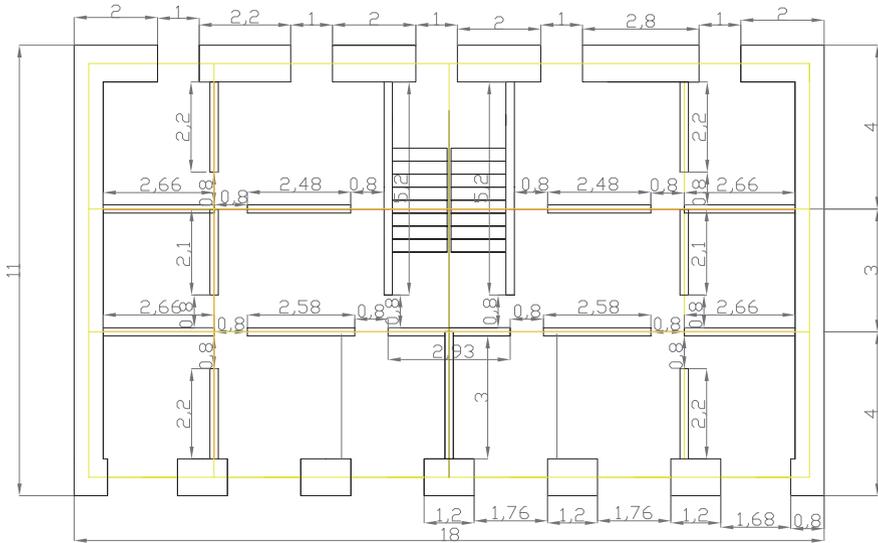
Sketch of the plan view of building: upper floors (dimensions in metres) [45]
